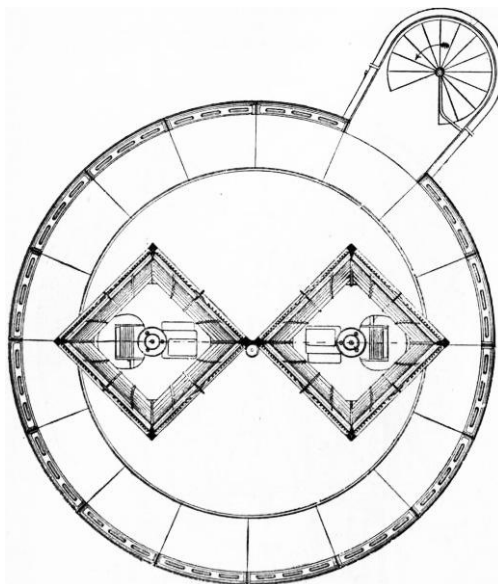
A.—Île Vierge Apparatus and Lantern. Plan at focal plane.
